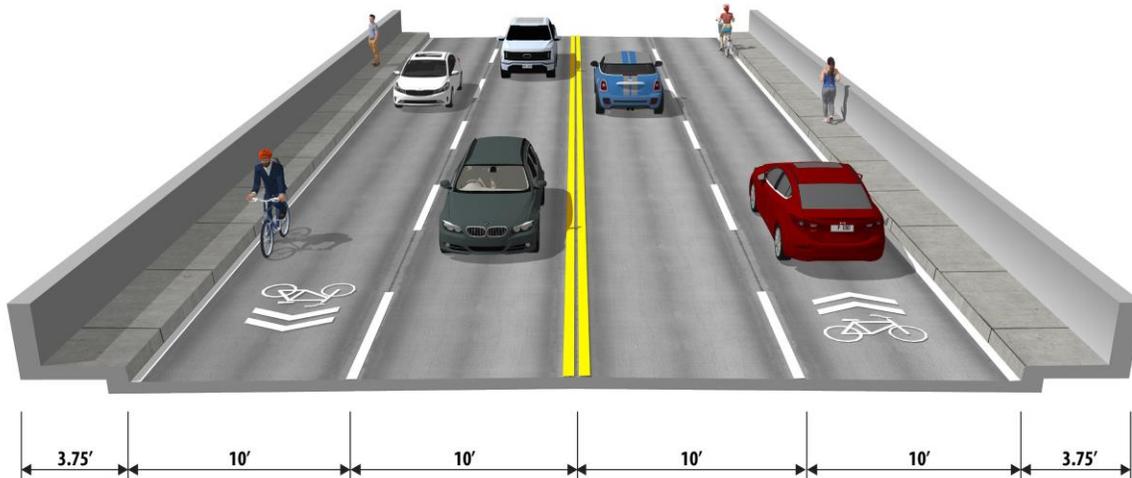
Existing Roadway Typical Section – Causeway Island
